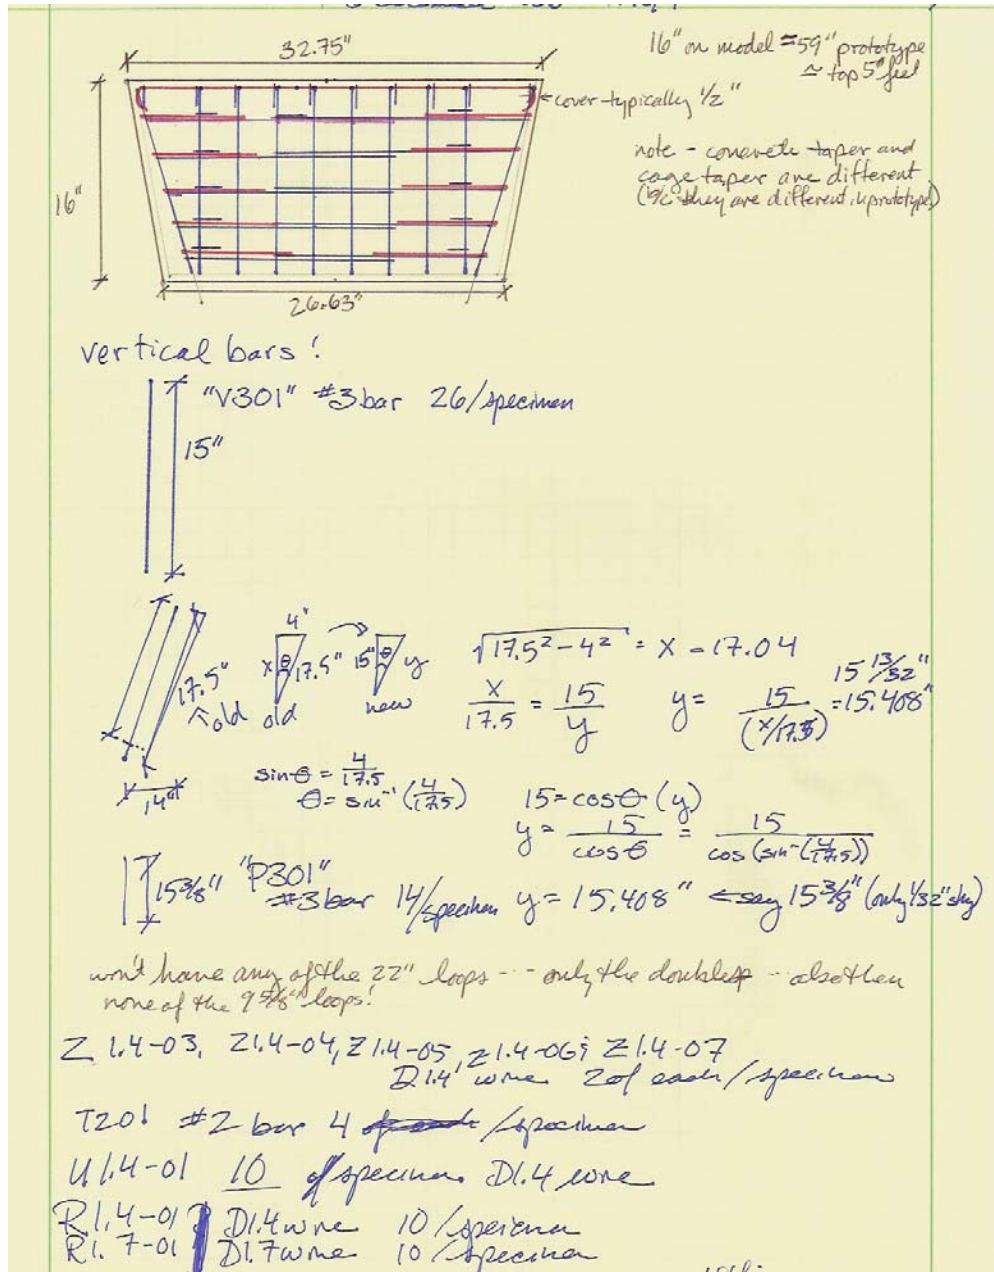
Bearing Specimen Reinforcing (1 of 3)
